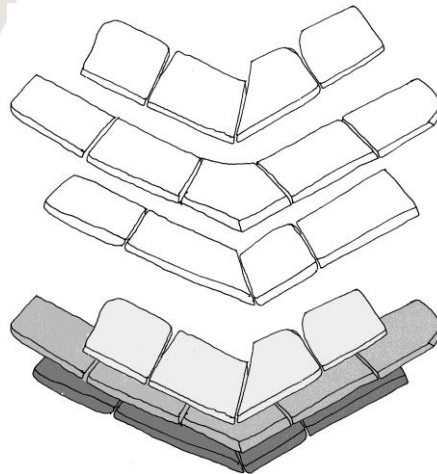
Sketch of roof cladding of multi-corner ground shape. Roof plates are tailored to fit in the roof line. There are up to four roof stone layers in vertical section.
